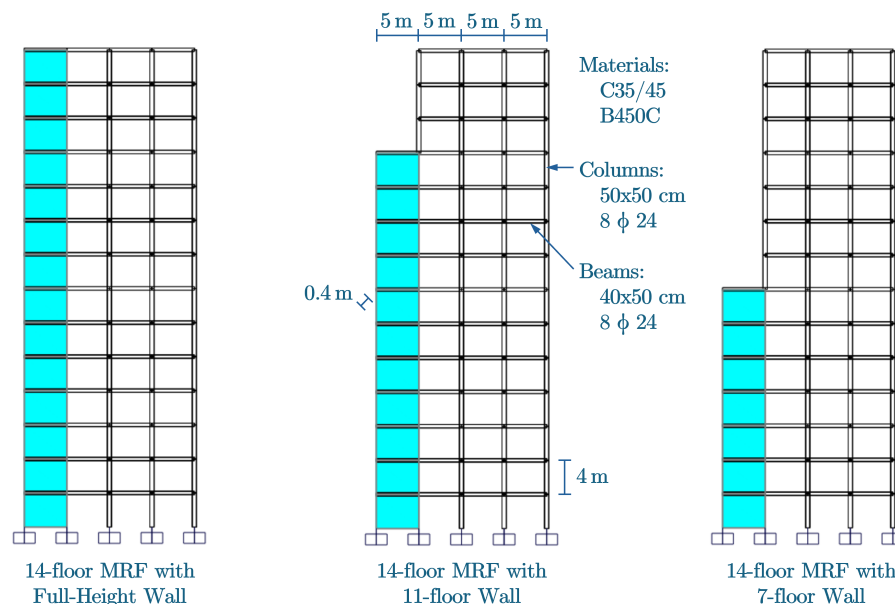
Model of the 14-floor moment-resisting frame with full-height, 11-floor, and 7-floor shear walls. Geometric and material characteristics are indicated.
